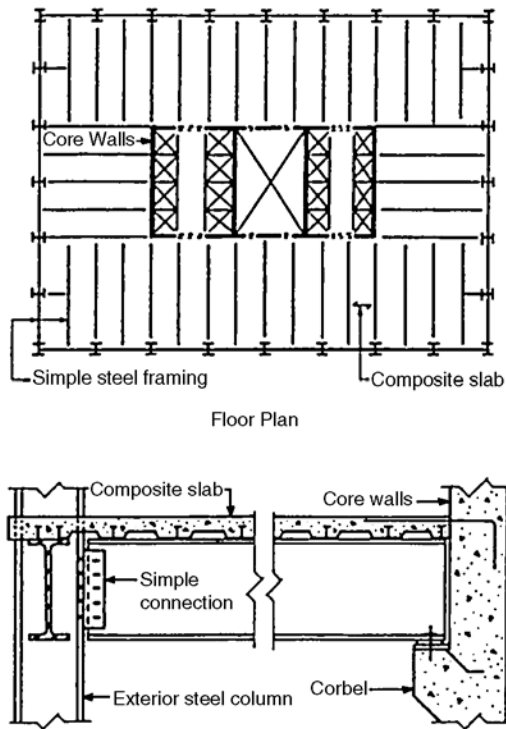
Core braced frame: (a) internal core walls with simple exterior framing, (b) beam-to-wall and beam-to-exterior column connections.
